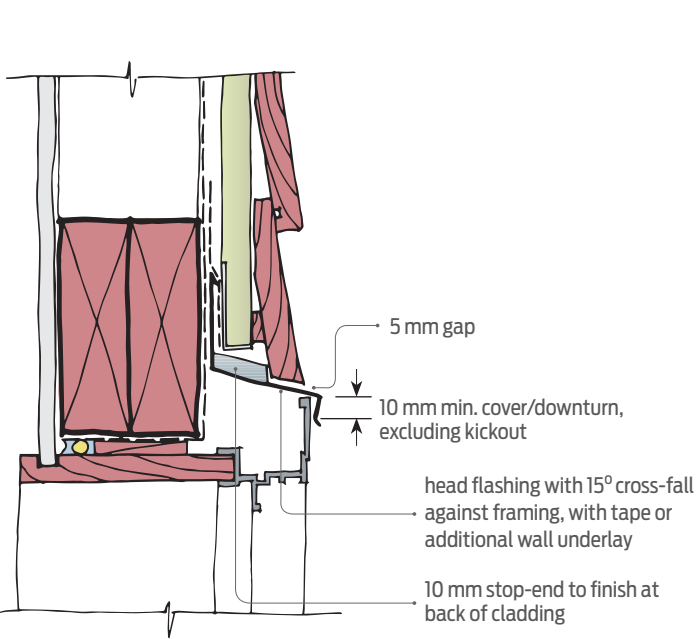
Minimum 15° cross-fall for head flashing to a window.
